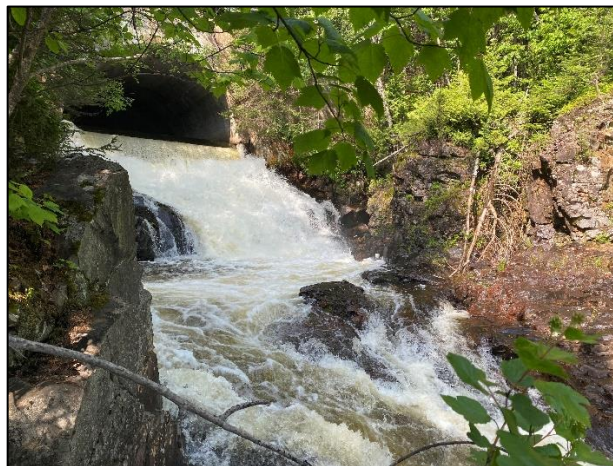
Outlet of Hewitson Creek culvert (July 2024).
